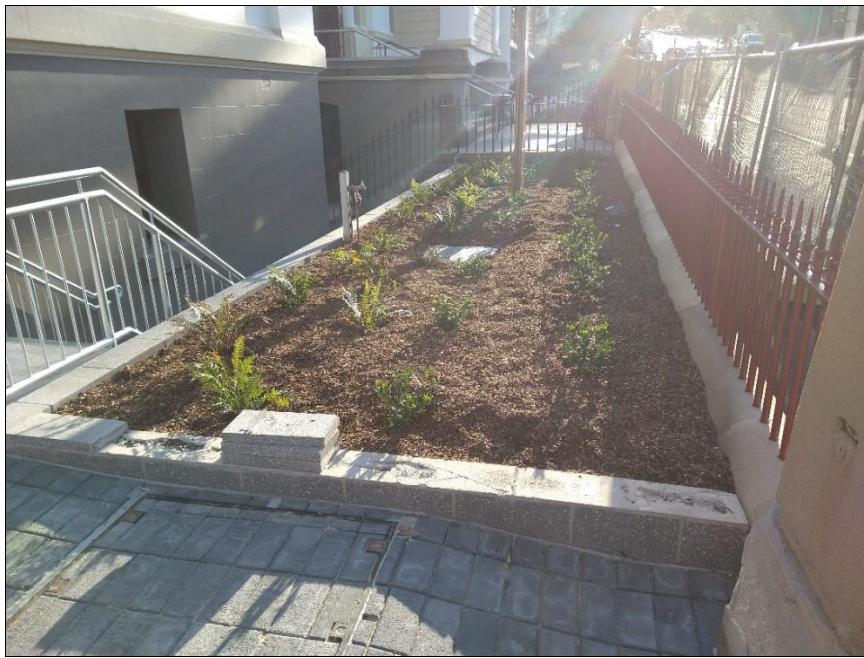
Looking west at concrete paving and adjacent garden bed along the northern side (front) of the central building (20 August 2021)
